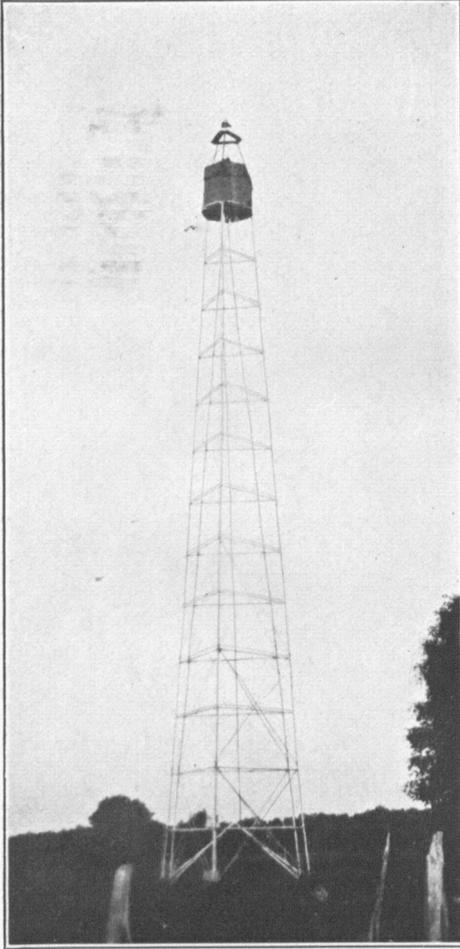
Ninety-foot Bilby steel tower, complete, showing observing tent
